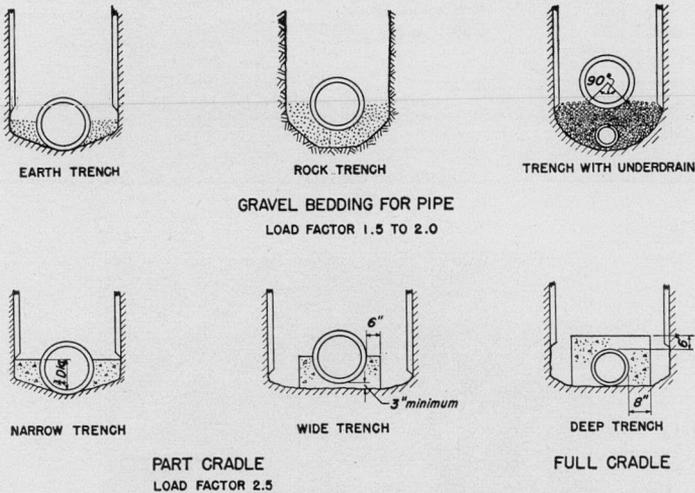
TYPICAL METHODS OF PIPE BEDDING AND PIPE CRADLING.
